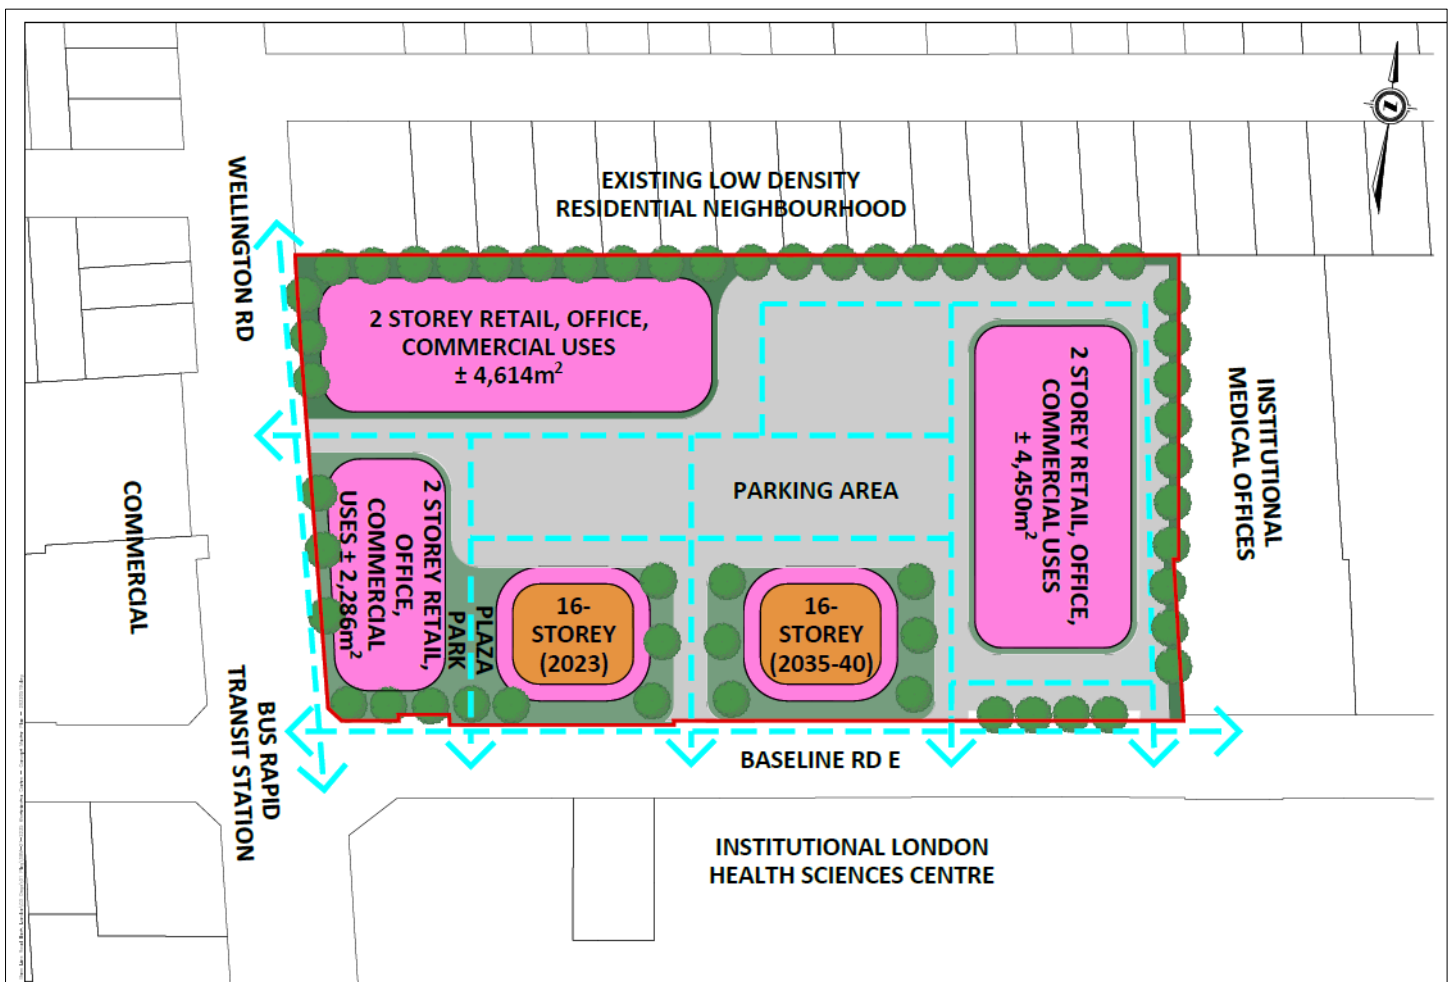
Proposed Site Master Plan submitted by Applicant July 2022
